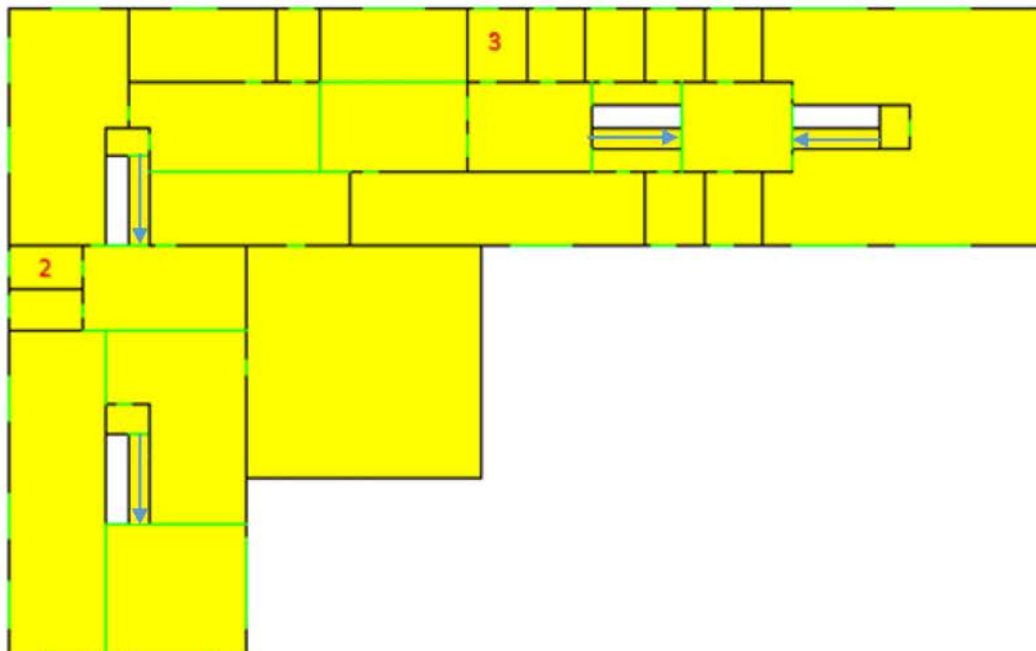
Simplified room layout for 50 George Square 1st floor.
